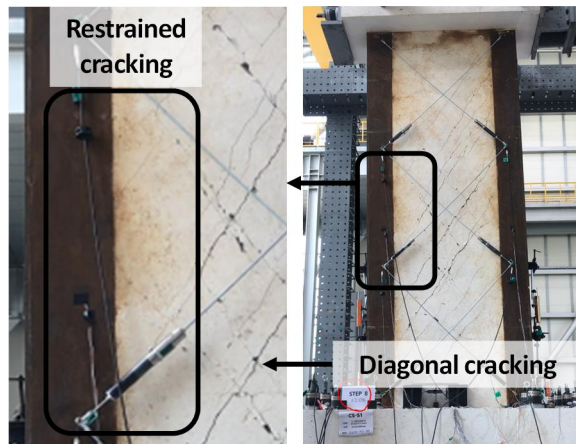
Restrained concrete cracking near the boundary steel U-section.
